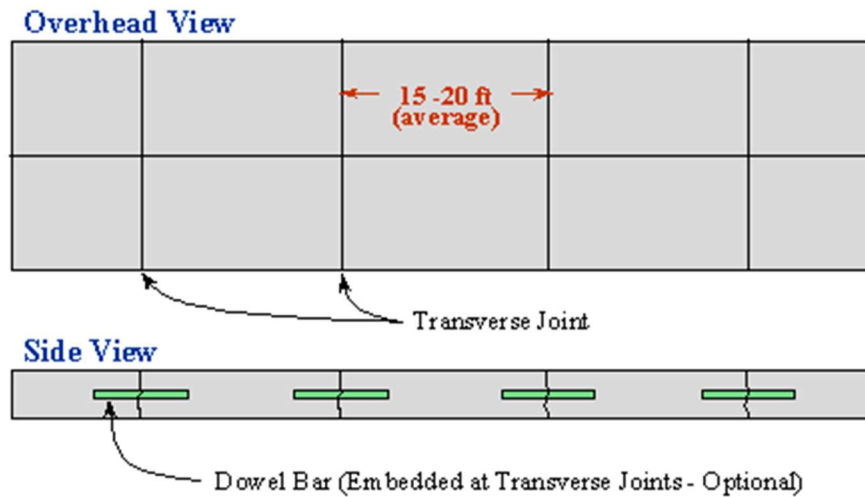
Cross-section and Top-view of Jointed Plain Concrete Pavement [59]
